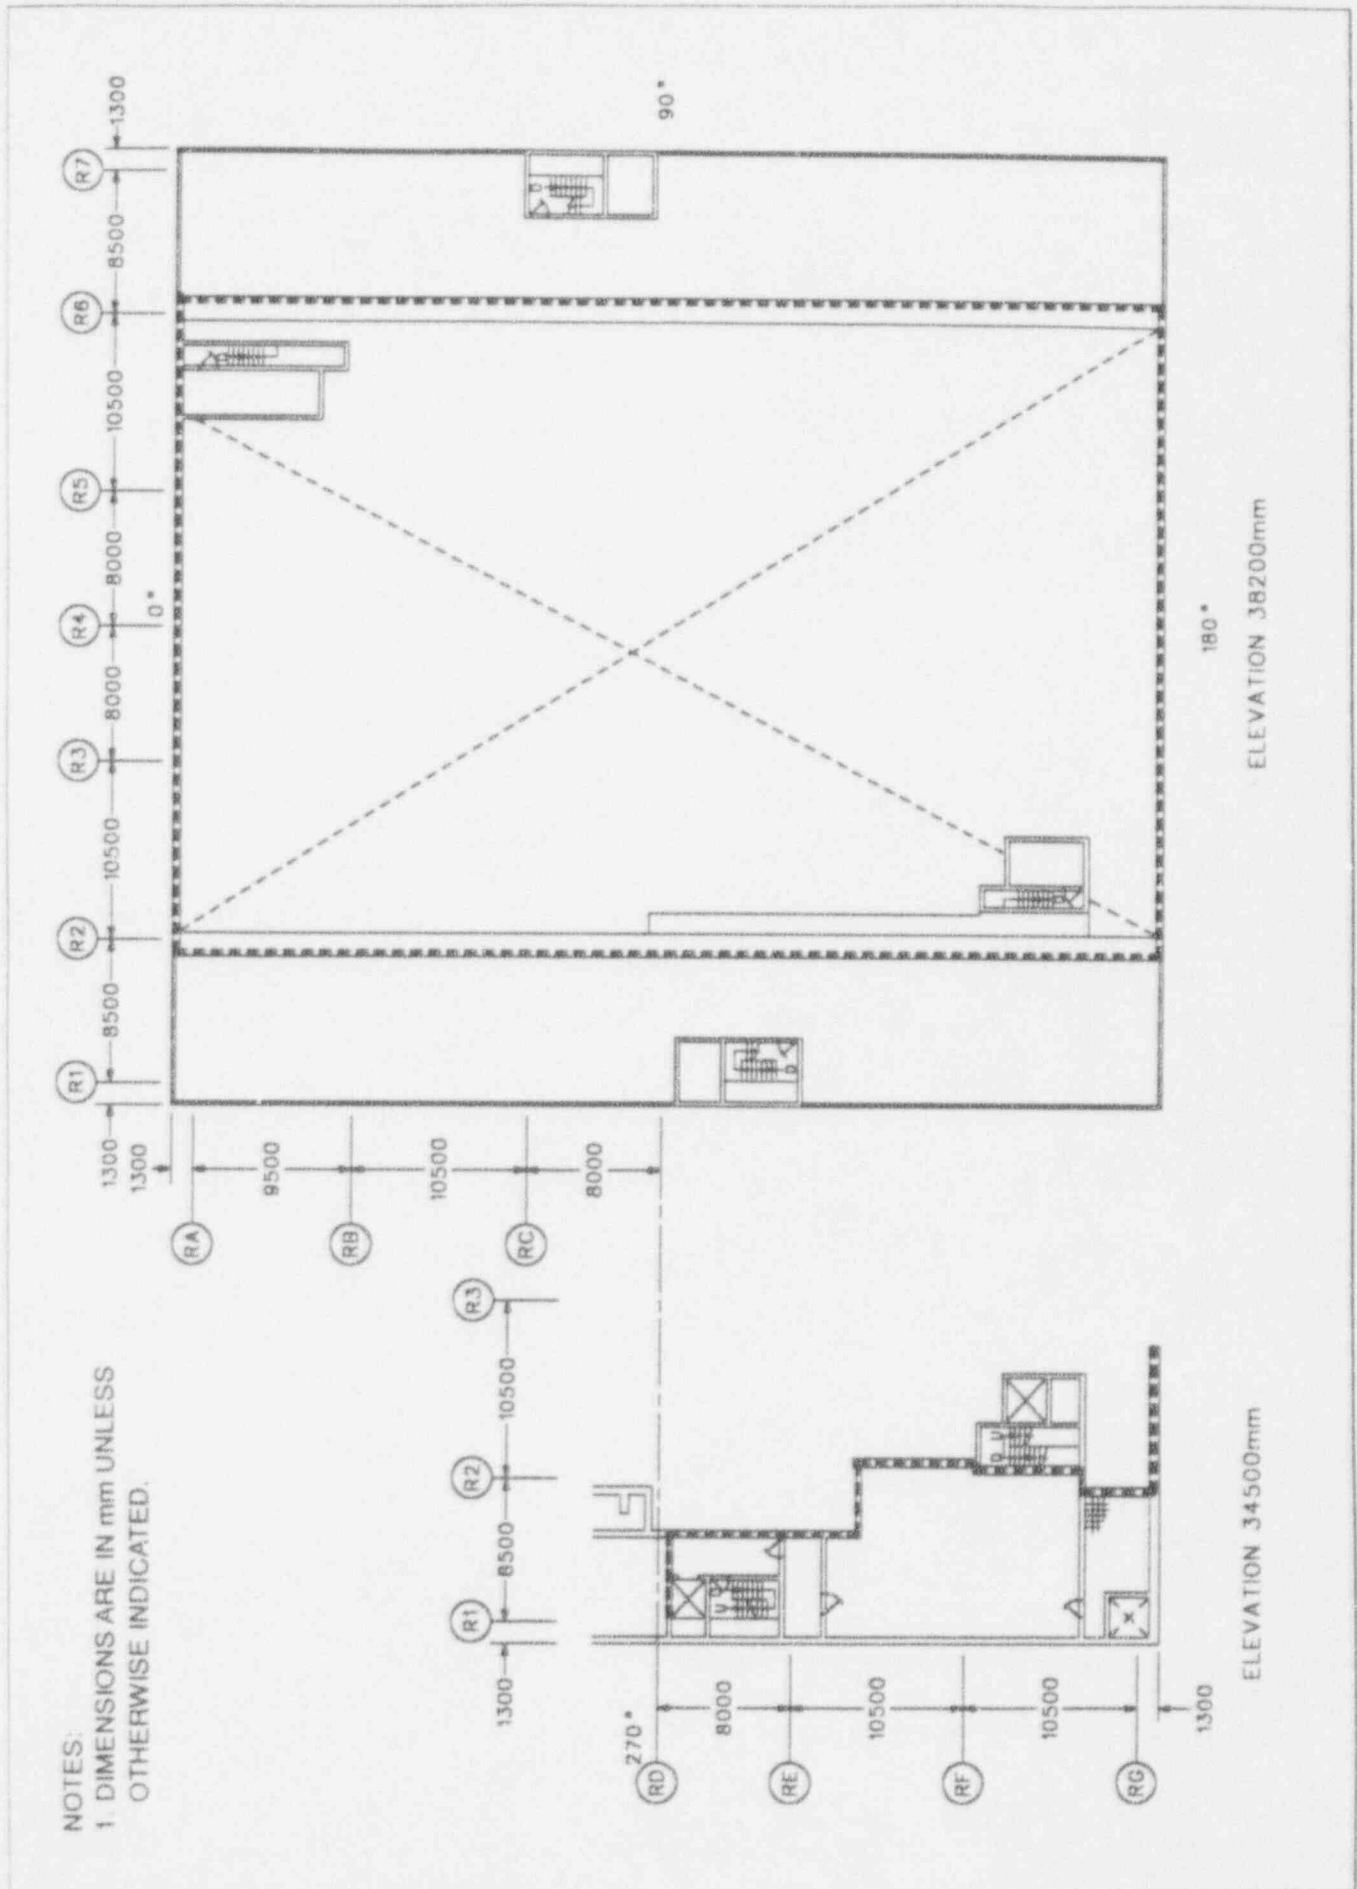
Reactor Building Arrangement—Elevations 34500 mm and 38200 mm
